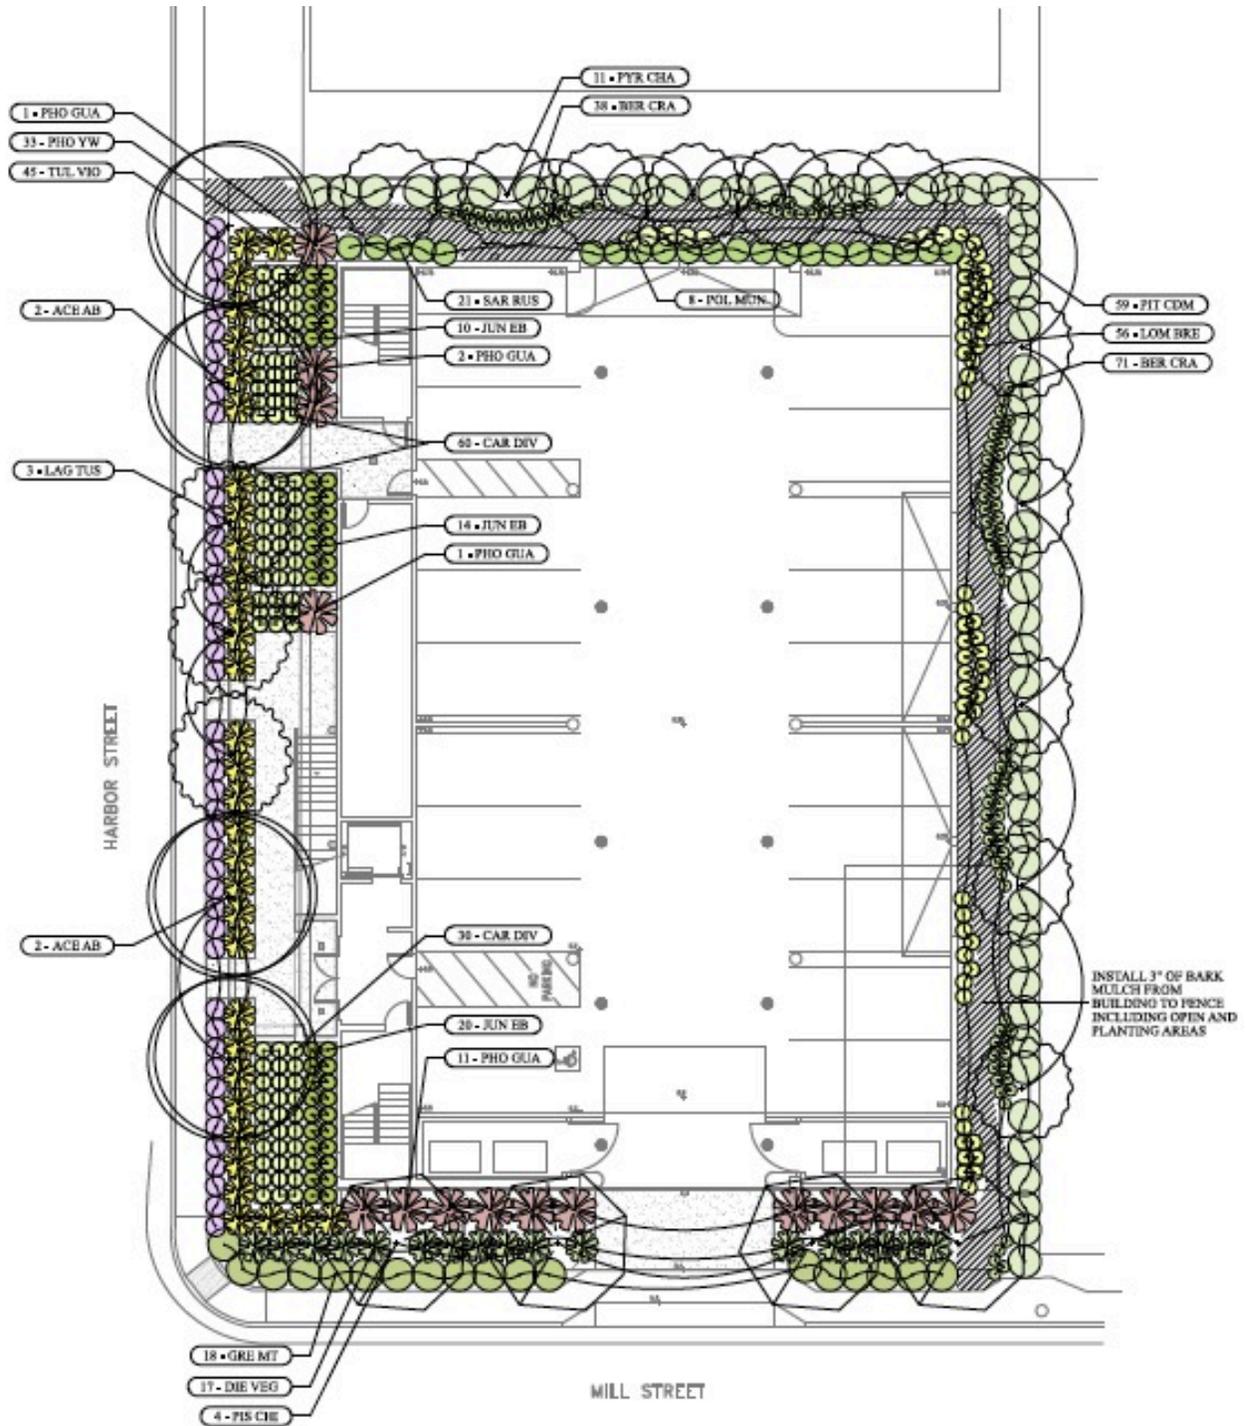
PROPOSED LANDSCAPE PLAN
